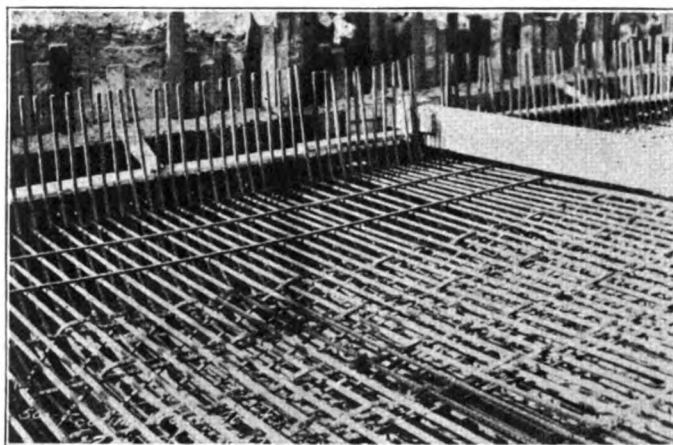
Reinforcement for the Footing of the West Abutment, Second Street Subway, "High Line" Construction, Kansas City Terminal.
